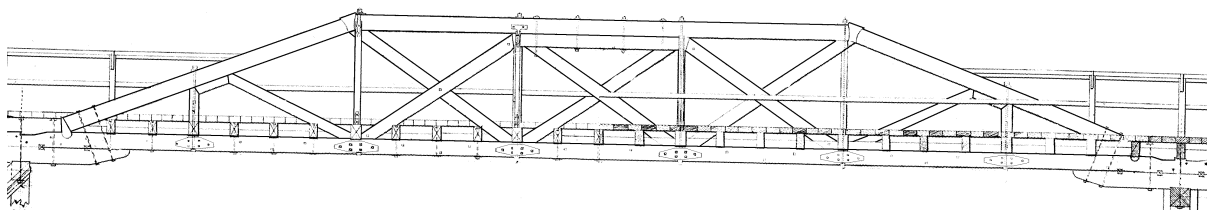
Monkerai Bridge, Old PWD, Designed 1881, Three Truss Spans of 70 ft each.
